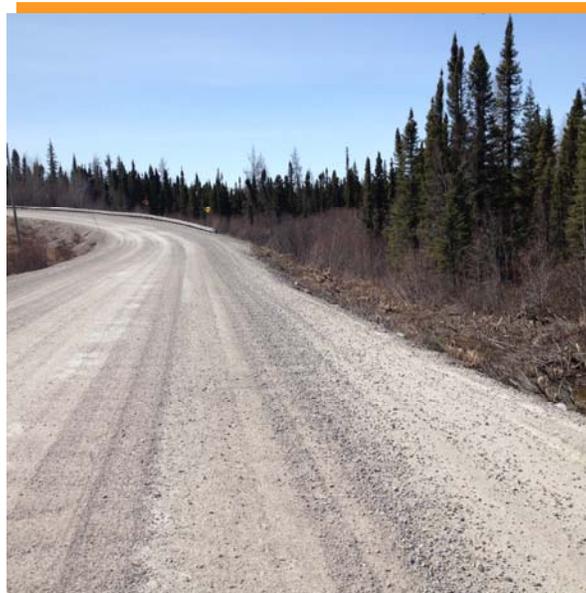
1+180 - TTOG 1800 - End of the guardrail
